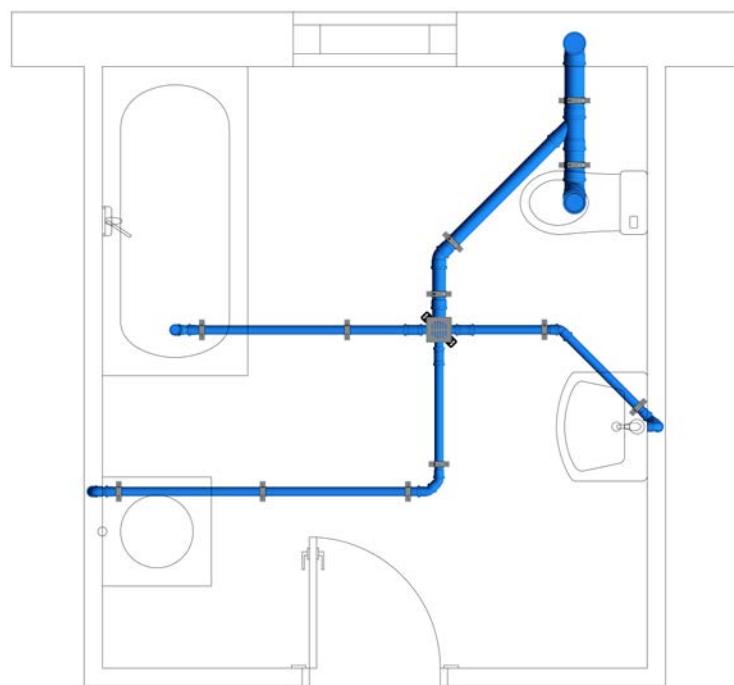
Example of waste branch with T-Trap used as shower drainage and fixed to the slab of the lower floor.
